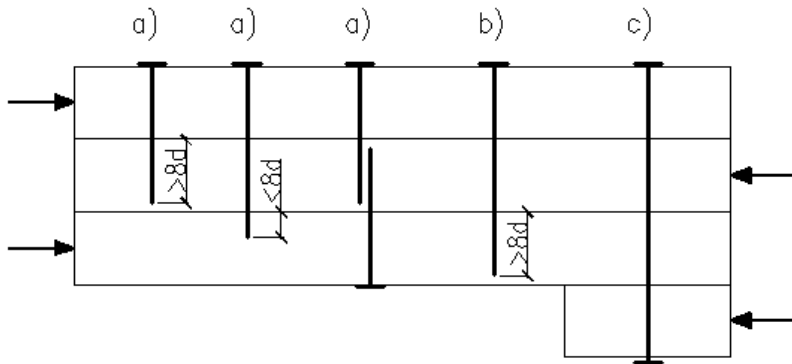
Single (a), double (b), and multi shear connections (c)
